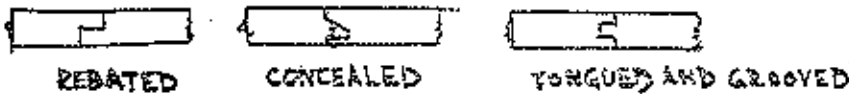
(a) TYPES OF WOODEN FLOORING JOINTS.
